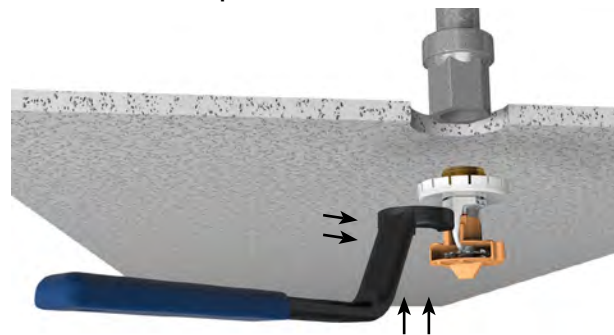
Recessed Installation (with Recessed Socket Wrench)
